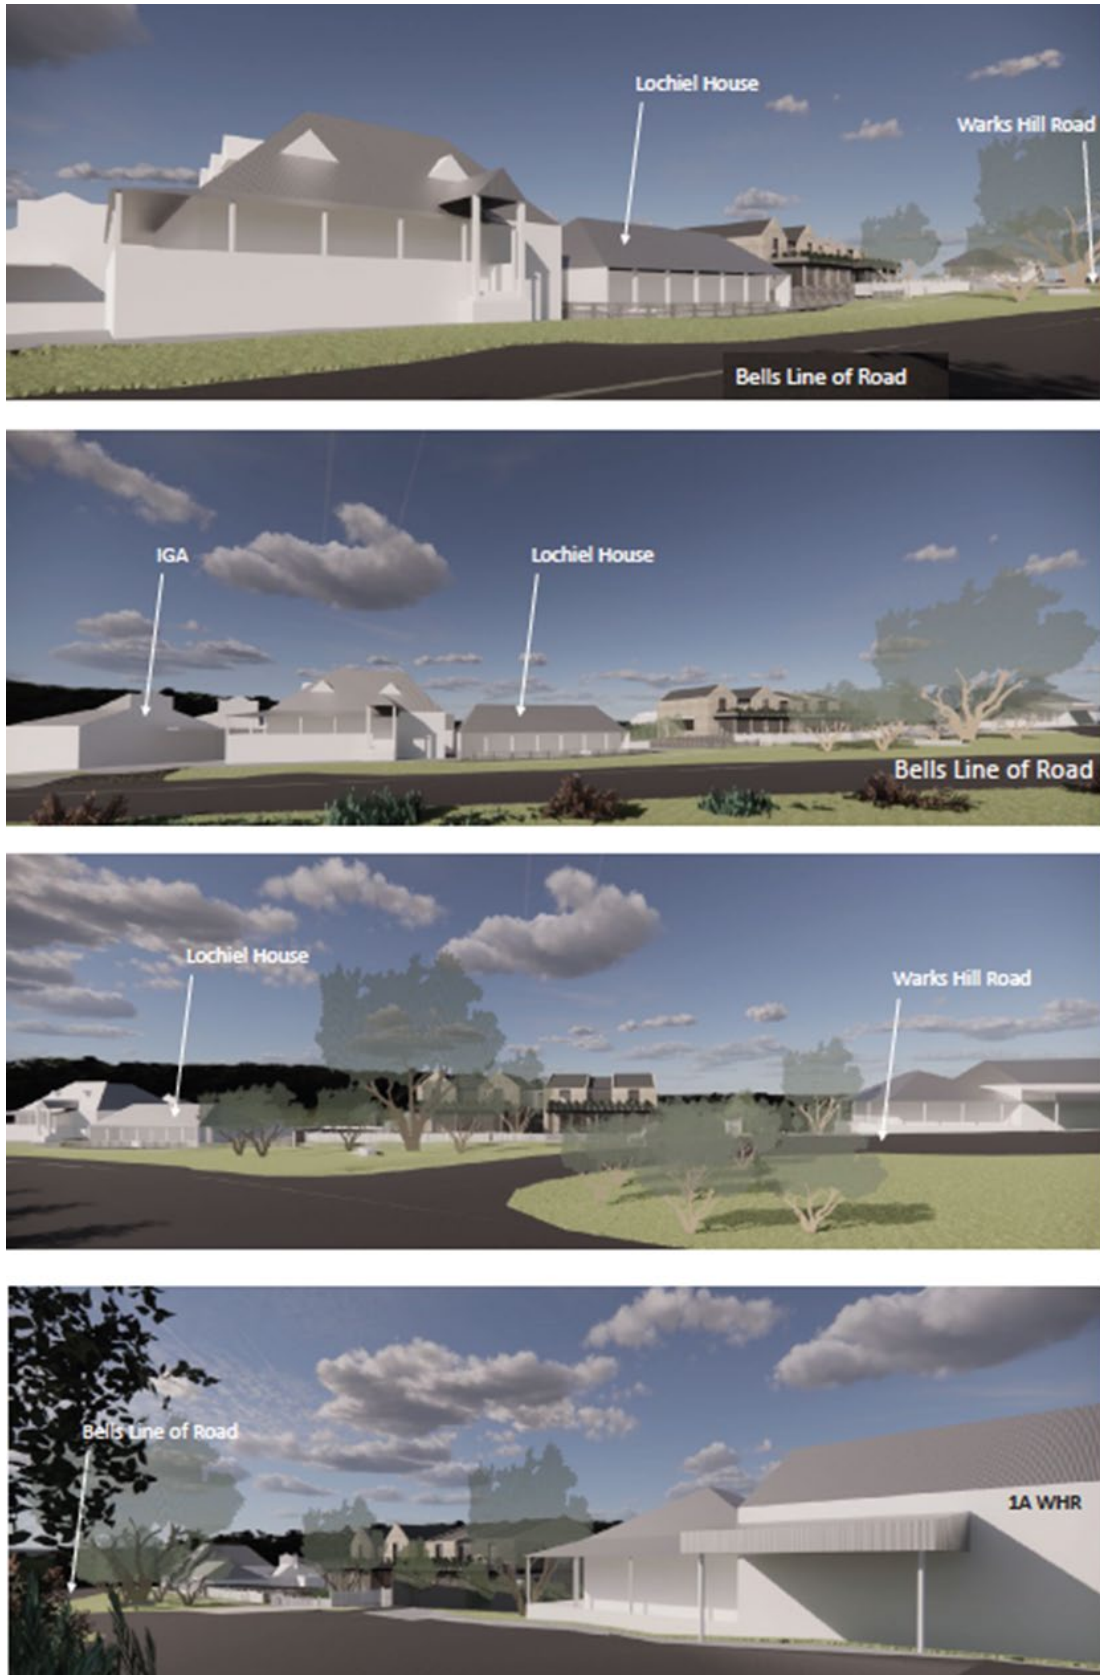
Photomontage of Pub as viewed from Bells Line of Road & Warks Hill Road.
